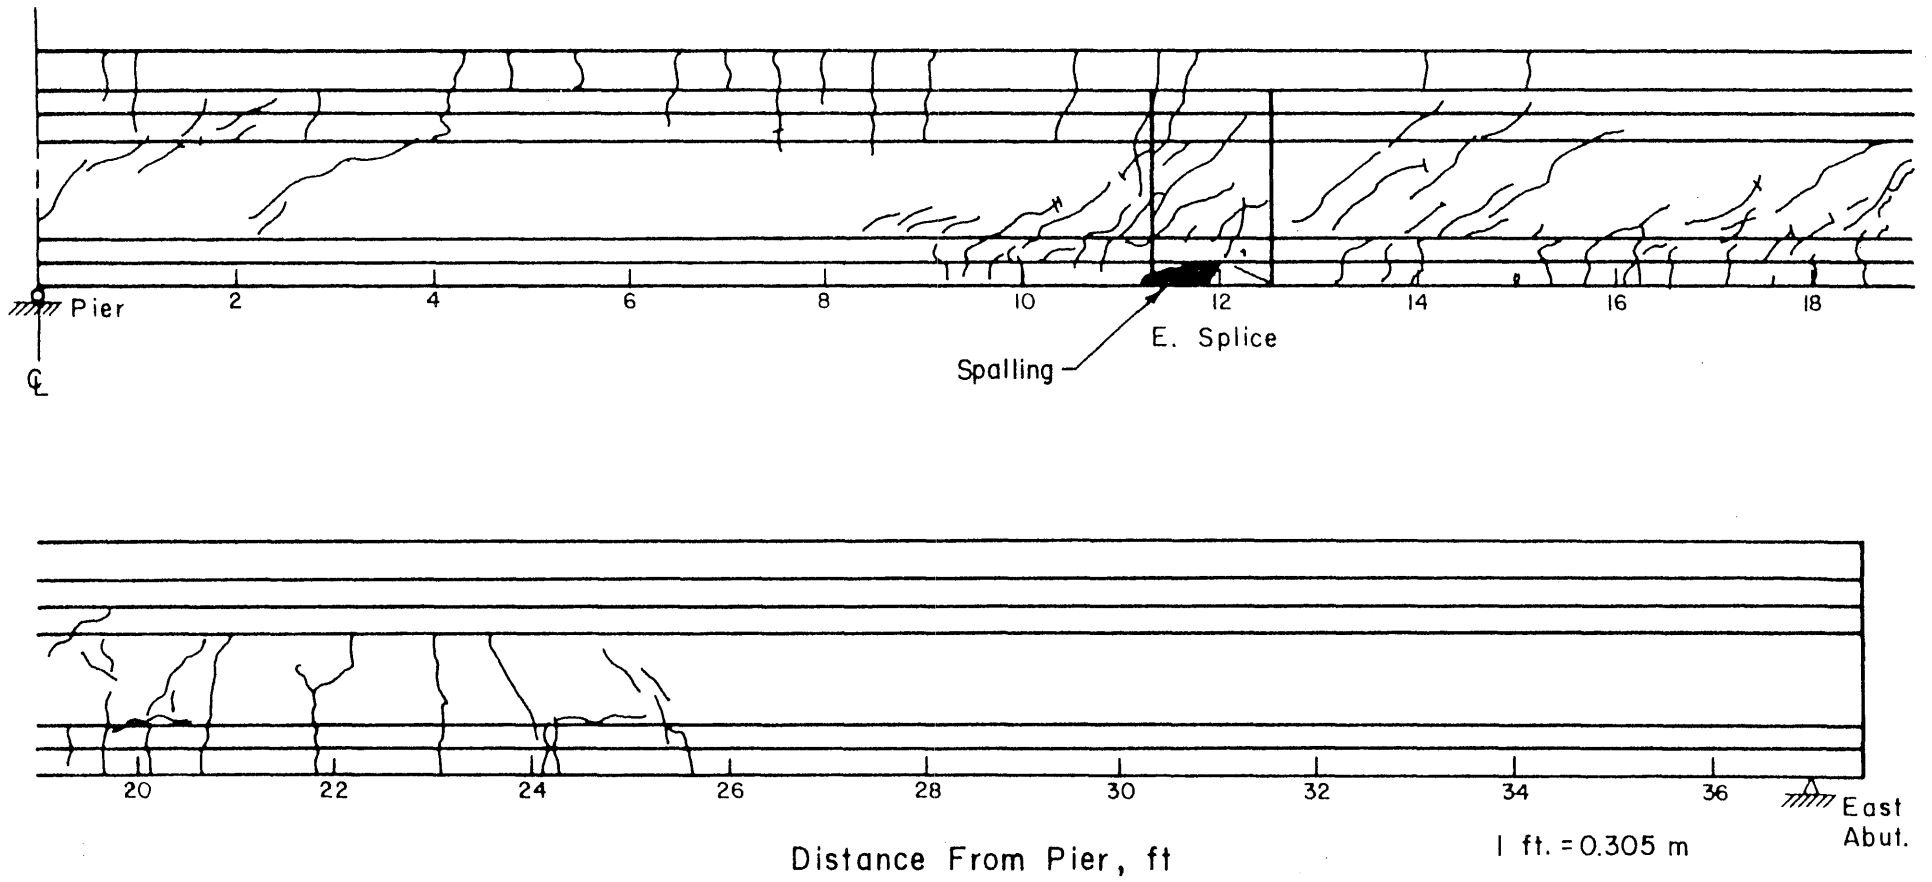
CRACKS IN THE EAST SPAN AT THE END OF TESTING, MODEL 1
